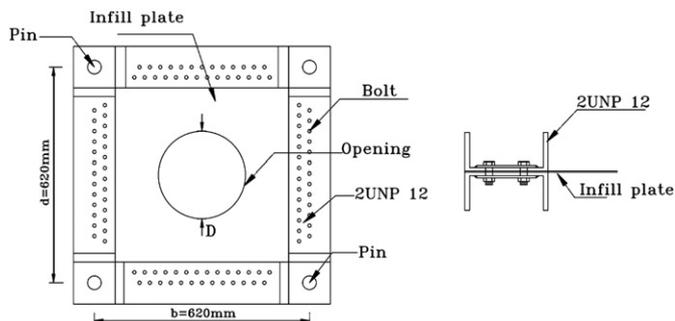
Specifications and dimensions of the frame and details of the plate connection to the boundary members of the SPW specimen.
